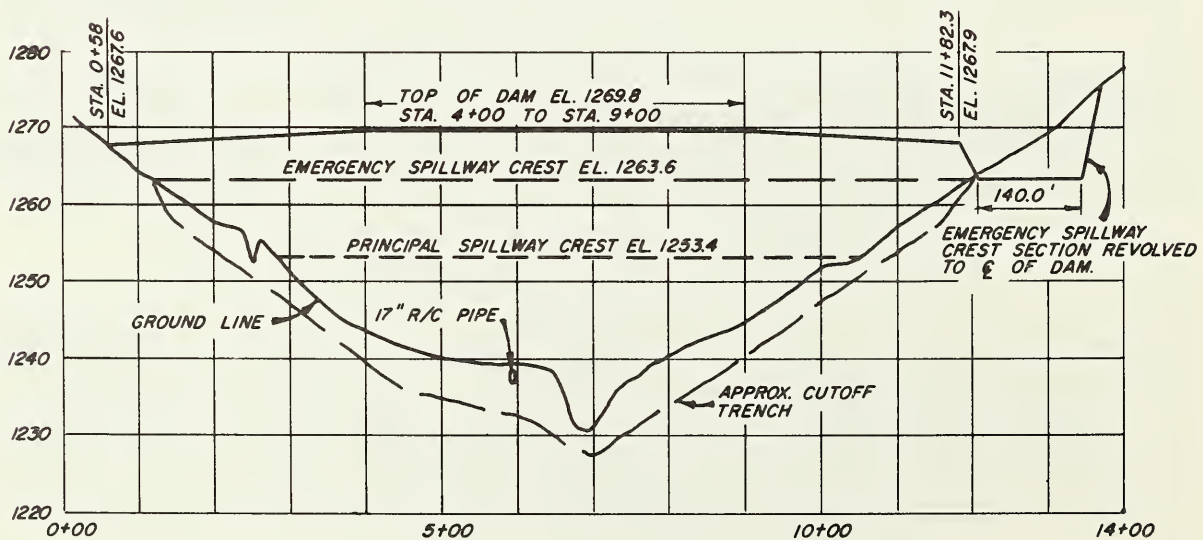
PLAN OF EMBANKMENT AND SPILLWAYS
